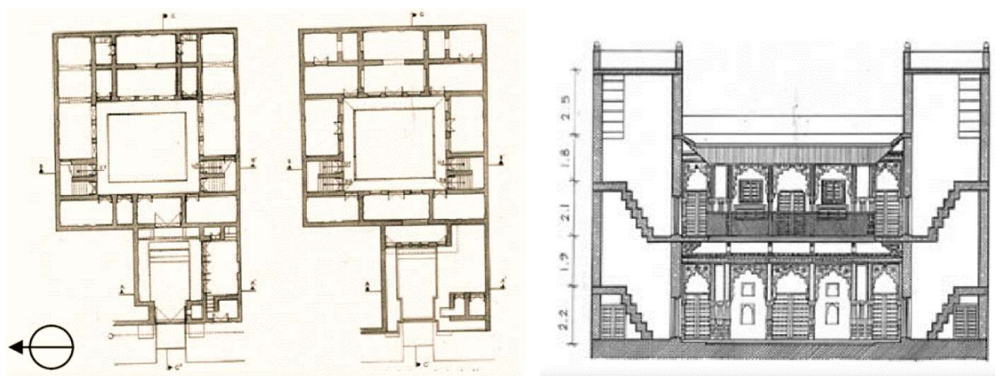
Typical plans and section of Rajasthan Haveli (Source: Agarwal et. All, 2006)
